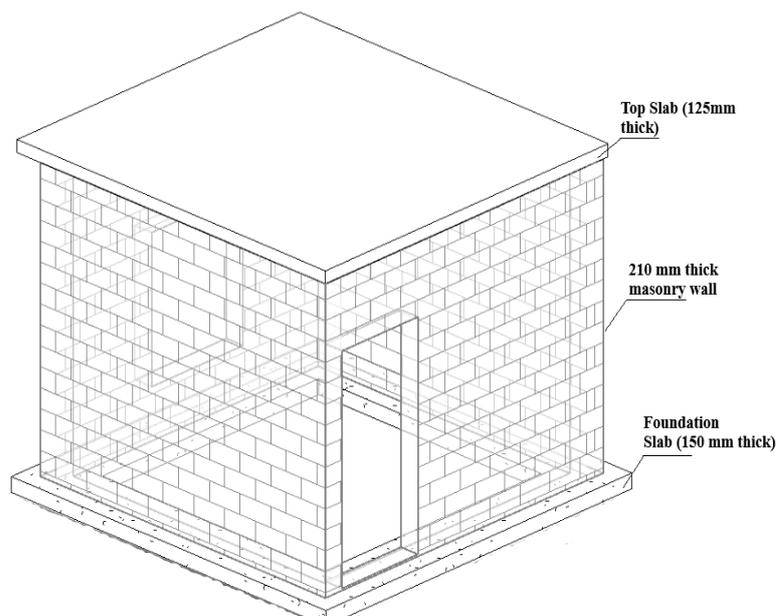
Schematic diagrams showing URBM specimens constructed on strong test floor
